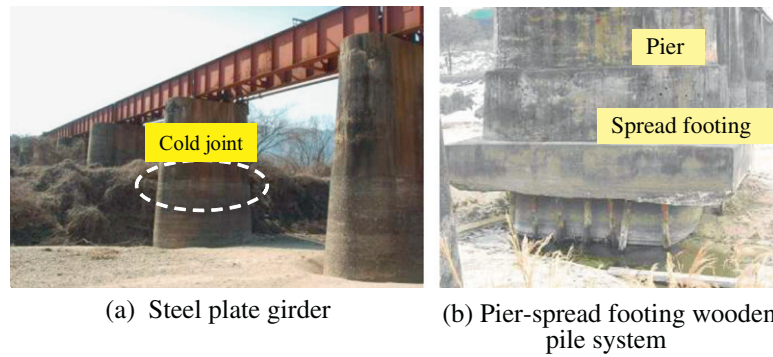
General views of open-steel-plate-girder railroad bridge.
